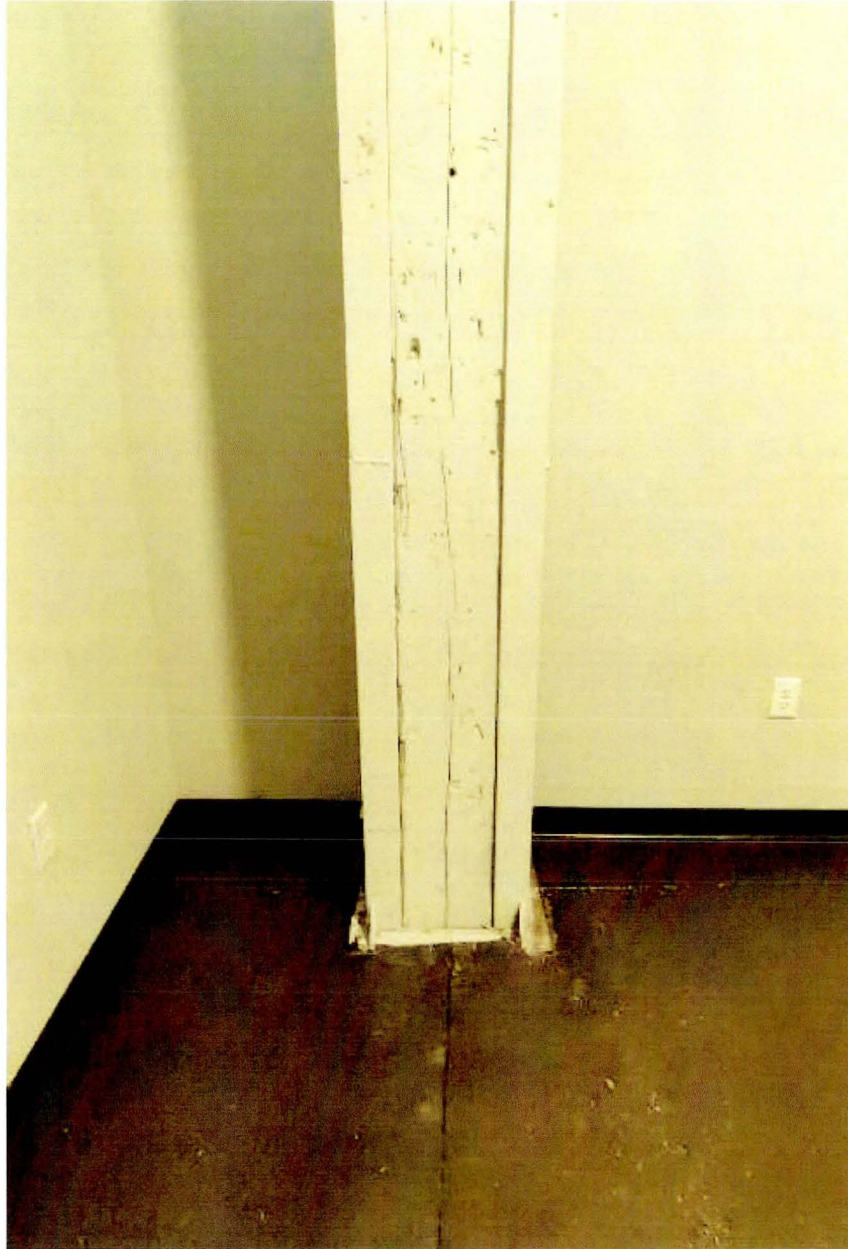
Unit 1014 - Wooden Pillar in the bedroom
